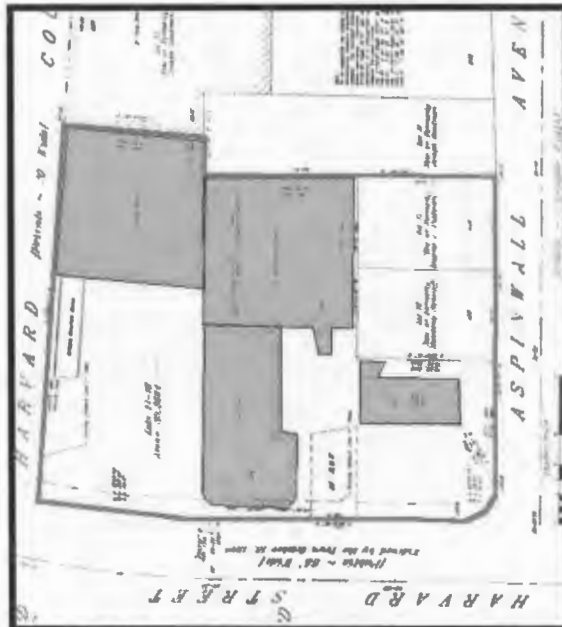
Site plan of former gas station and auto repair shop. Corner of Harvard and Aspinwall Streets, Brookline, Massachusetts. Courtesy of Ryan Engineering Corporation.
